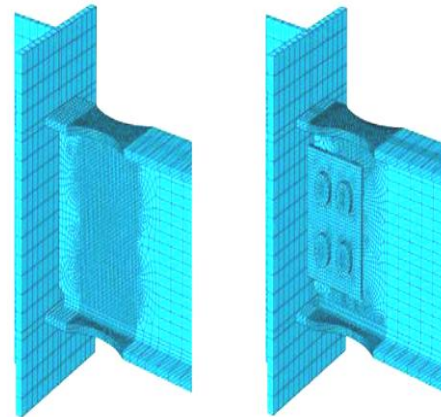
Welded Flange – Welded Web and Welded Flange-Bolted Web
